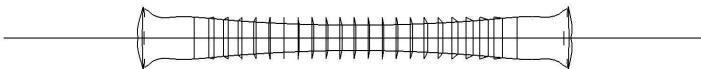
Top view of final deformation of improved cable-stayed arch bridge ($k=4.42$)
